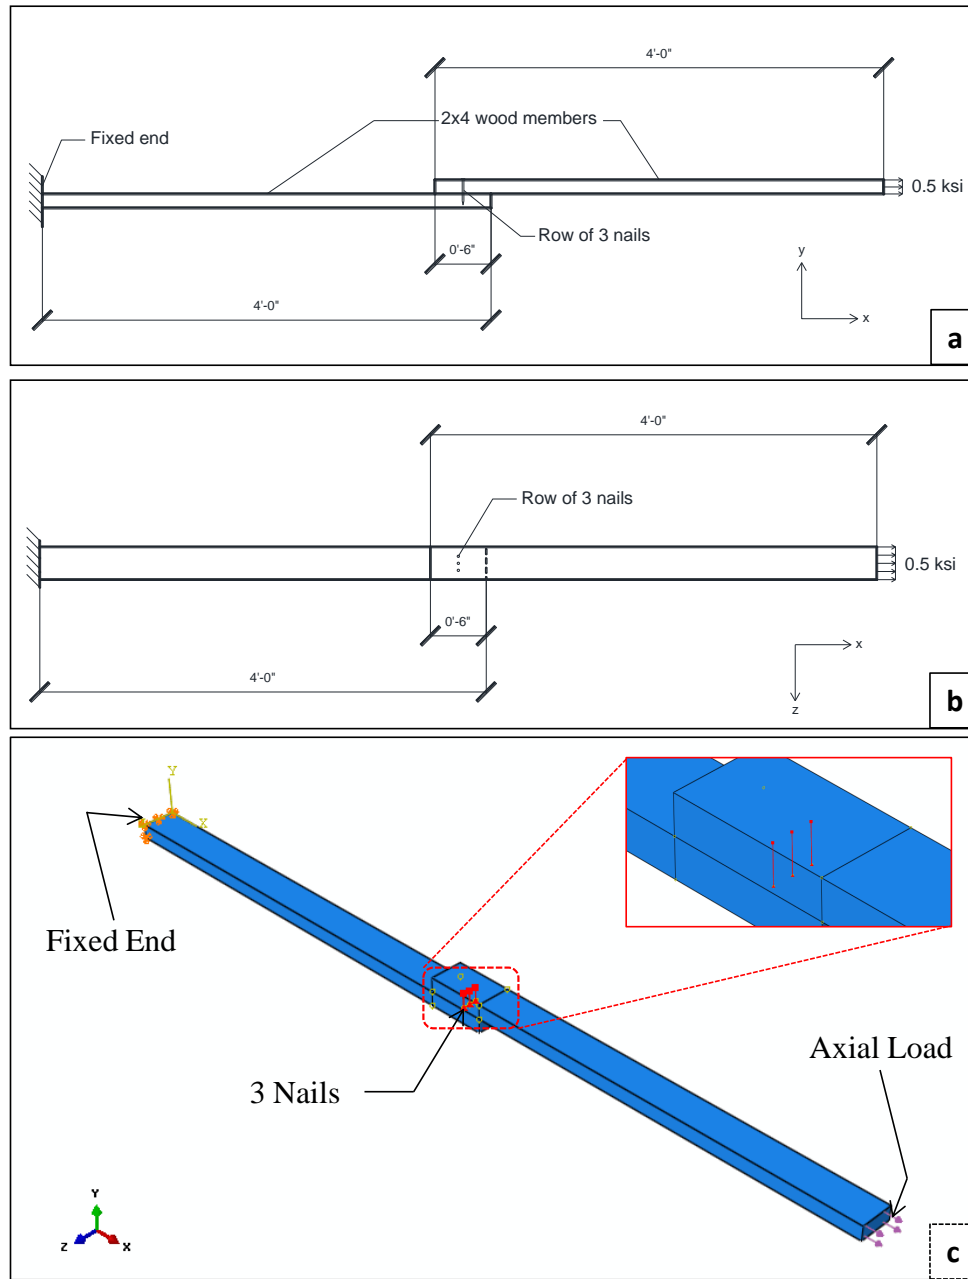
Single-shear model (a) Elevation view (b) Plan view (c) Rendered Abaqus model
